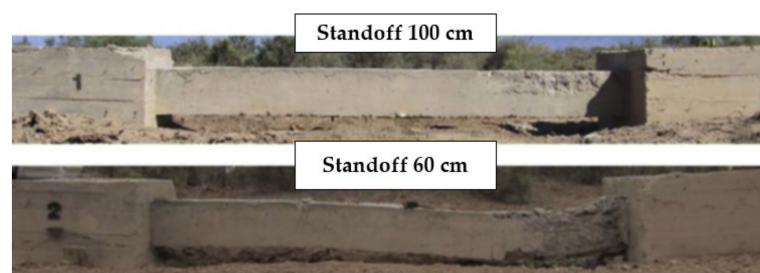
Damage of the RC columns after detonation at 100 cm and 60 cm standoff [14]. Copyright permission obtained from authors.
